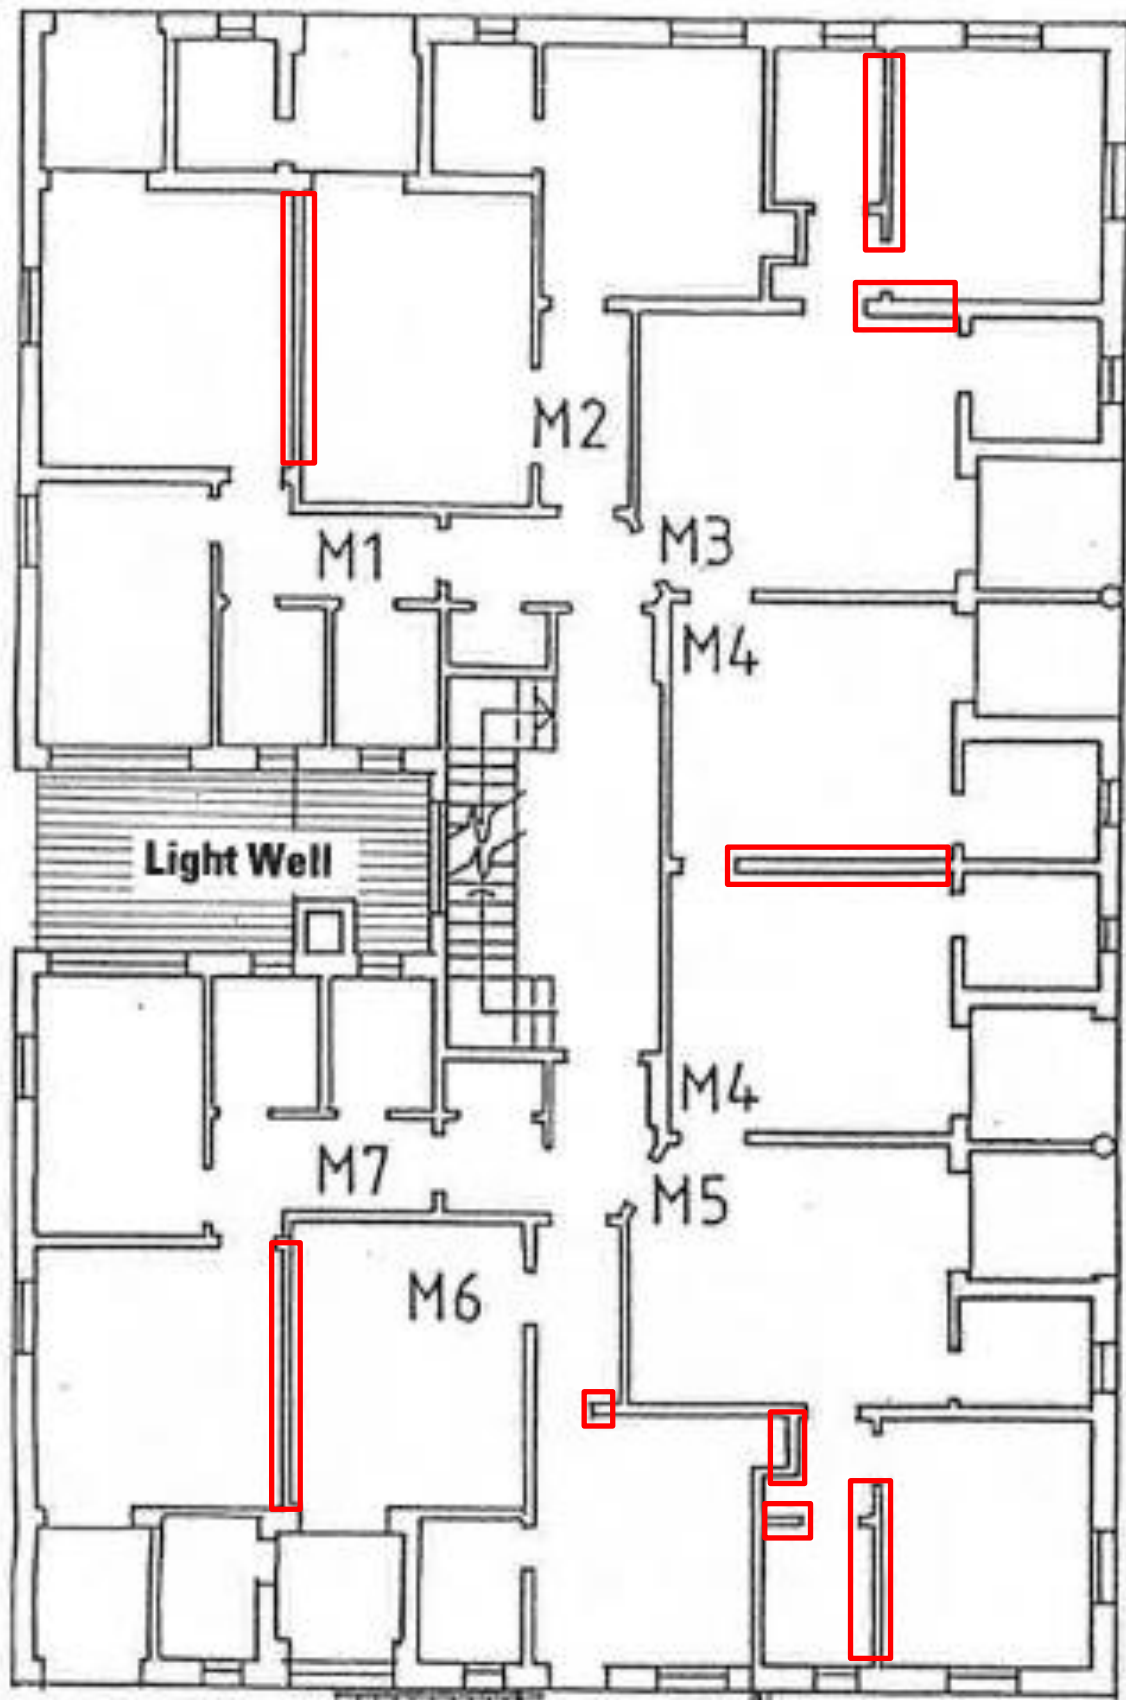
Level 1 plan of Wilkinson House in 2001, as compiled in the 2001 GML CMP. Demolished walls have been highlighted in red.
